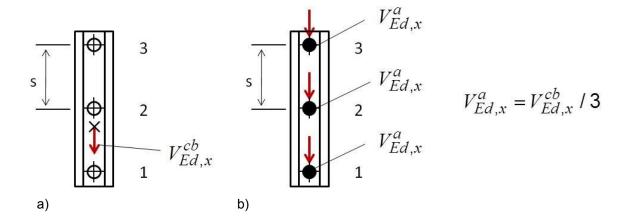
Distribution of the acting shear load to the anchors for anchor channels remote from the edge – Example
